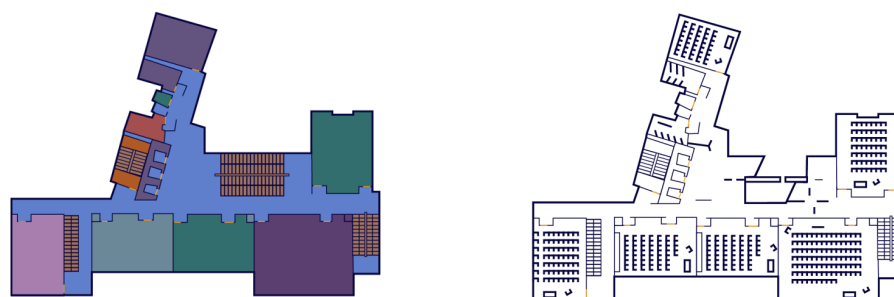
Construction plan of the building with its Pathfinder equivalence.
